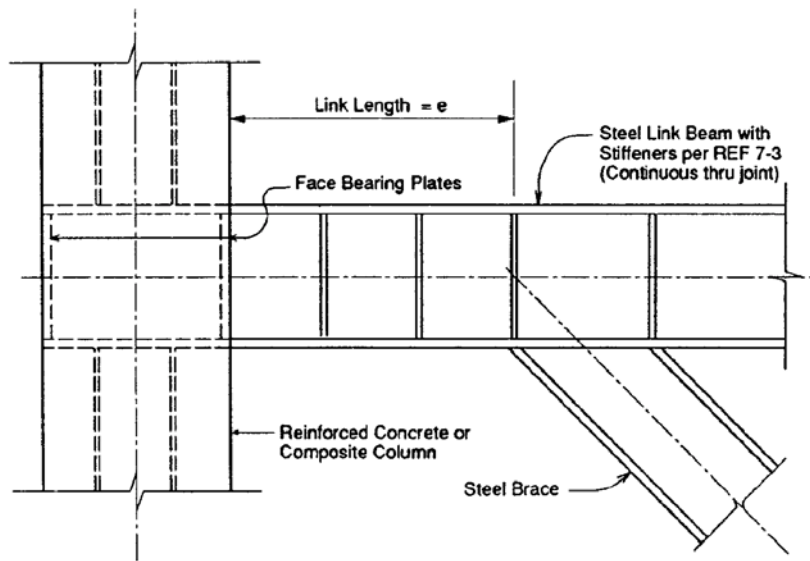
Reinforced concrete (or composite) column-to-steel eccentric brace.
